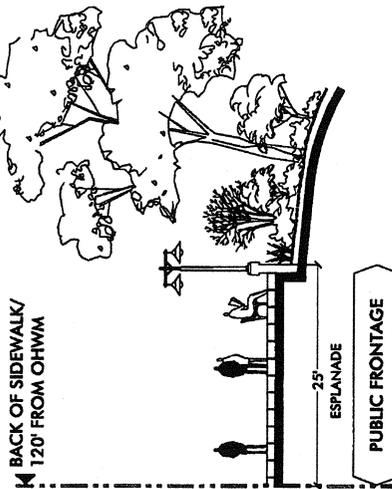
TUKWILA POND ESPLANADE SECTION
